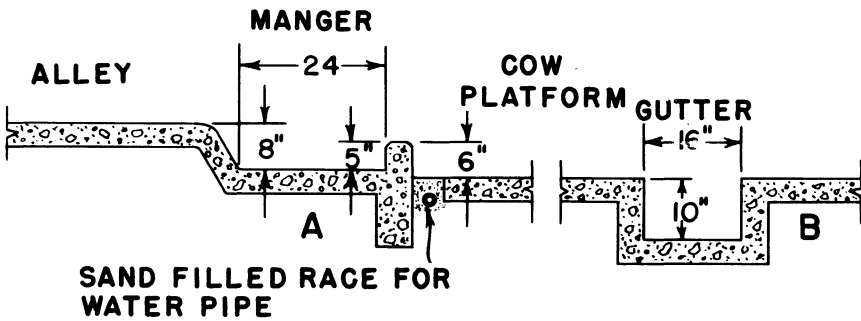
Concrete sweep-in-type dairy manger and concrete gutter.
